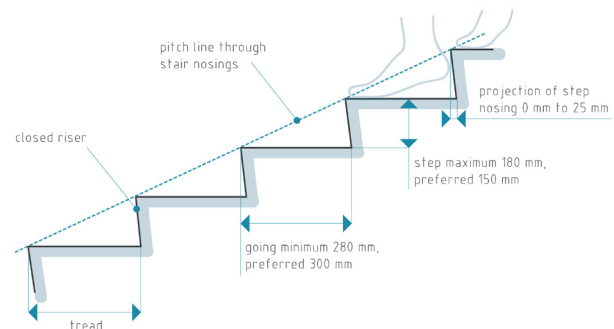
Stairs, in some countries, the nosing and projection must not be used at all (Suláková according to EN 17210:2021)
